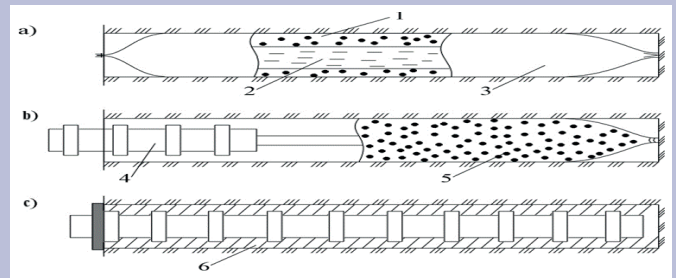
Mounting a reinforced concrete anchor on the basis of a cement mixture: a) – cement cartridge in a spur, b) – inserting an anchor rod into the chuck, c) – construction of the anchor; 1 – cement, 2 – aqueous capsule, 3 – cartridge outer shell, 4 – anchor rod, 5 – mixing the mixture, 6 – solid cement mixture.
